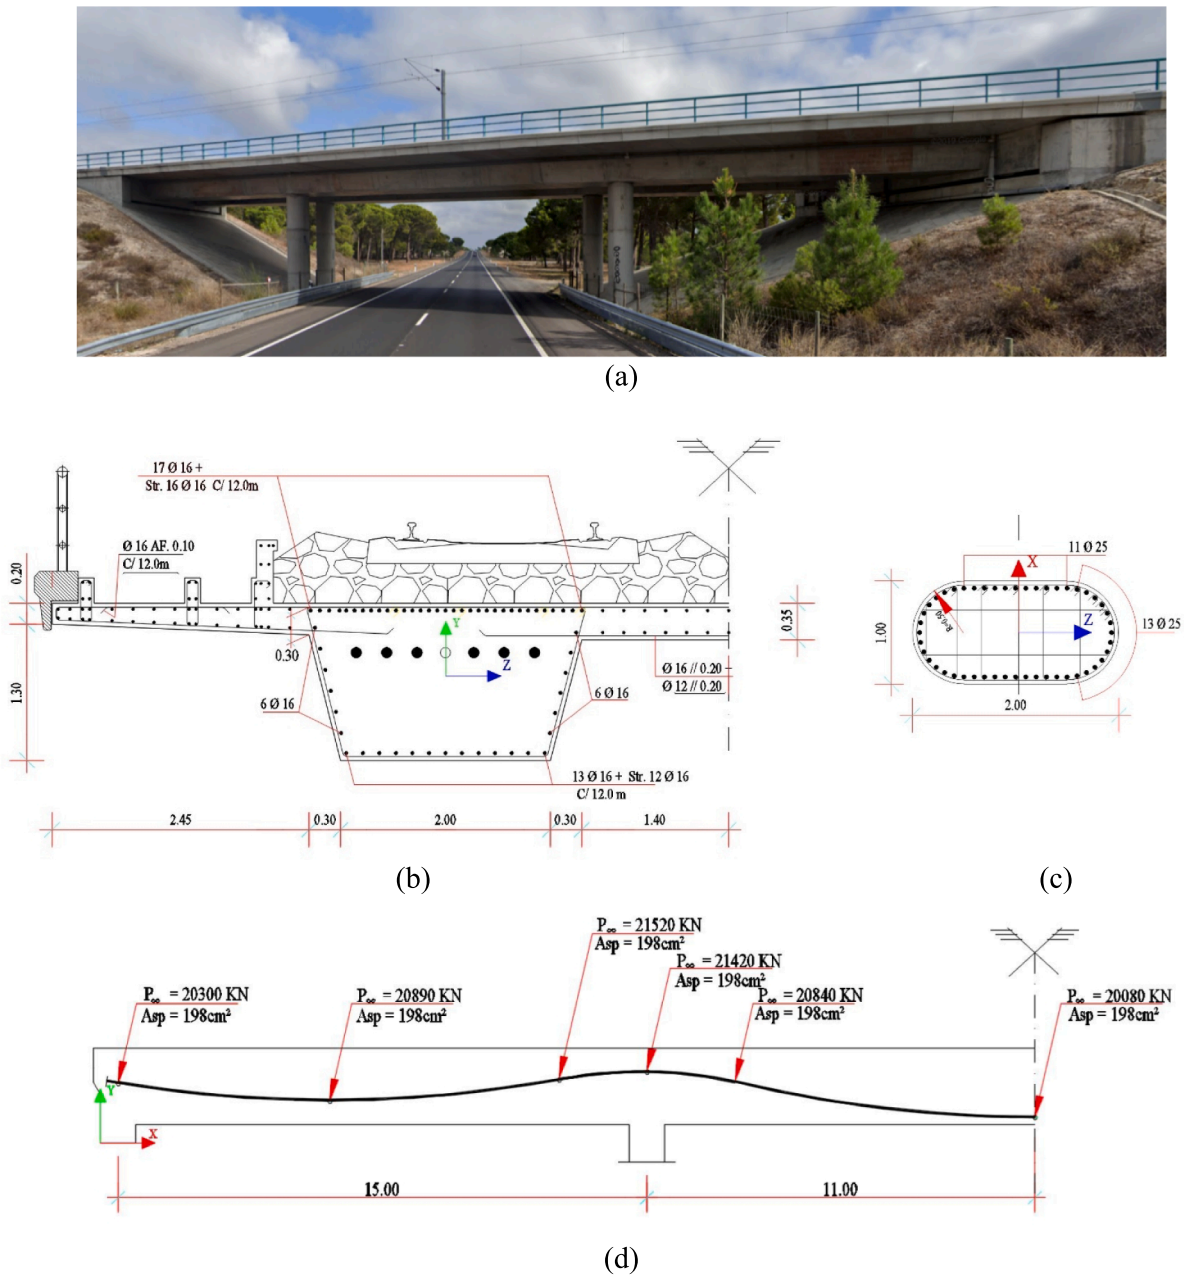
Case study; (a) picture (google maps view); (b) reinforced superstructure cross-section; (c) piers cross-section; and (d) prestressing cables layout and their minimum expected prestressing forces obtained from blueprints (). Adapted from:[39]
